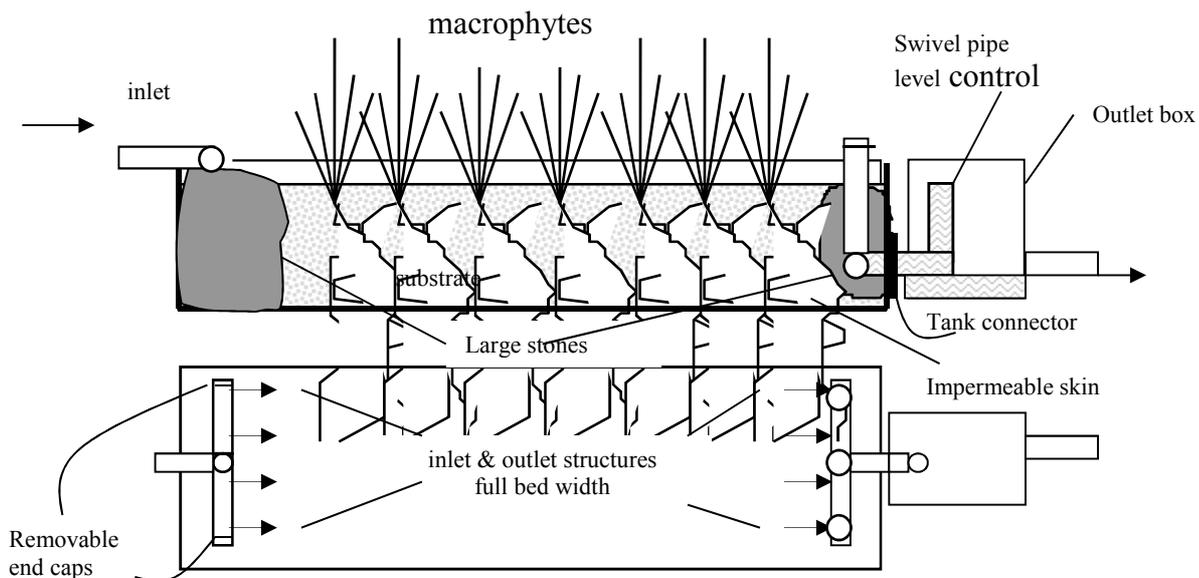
Elevation and plan views of typical horizontal subsurface flow wetland showing major components
